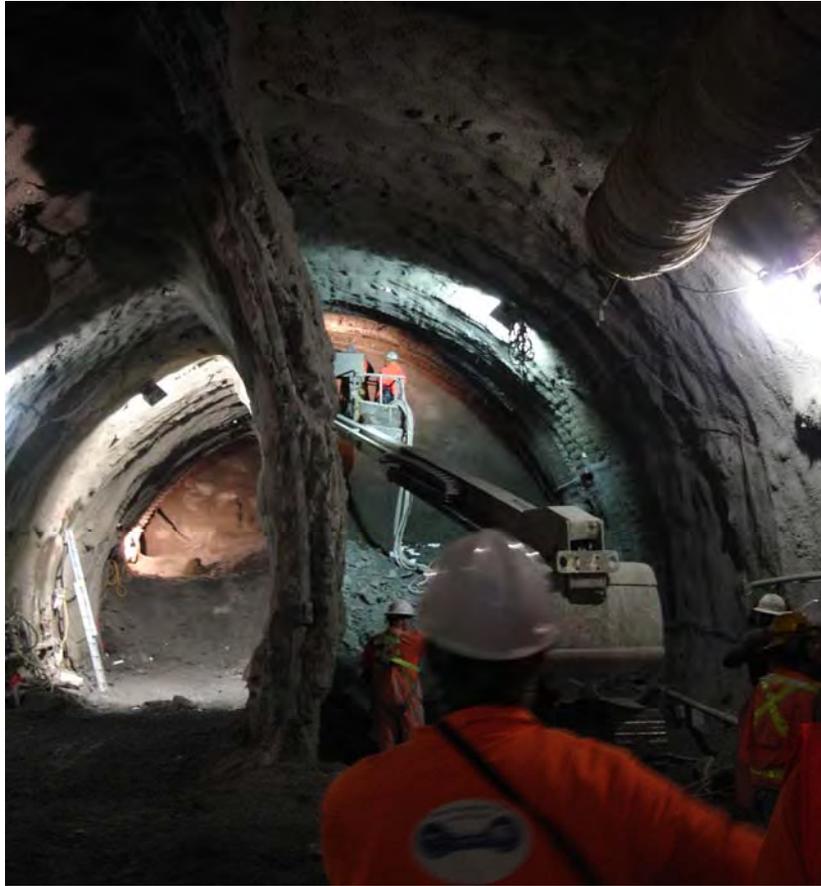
Typical Tunnel Excavation with Temporary Middle Wall (Beacon Hill Station, Washington)
